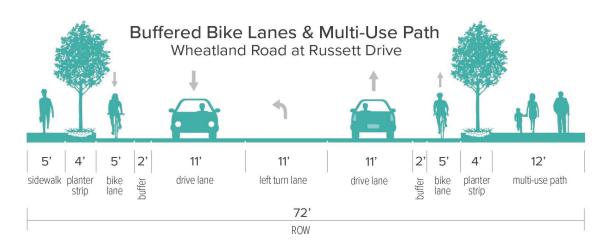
MULTI-USE PATH CROSS SECTION (AT RUSSETT DRIVE)
